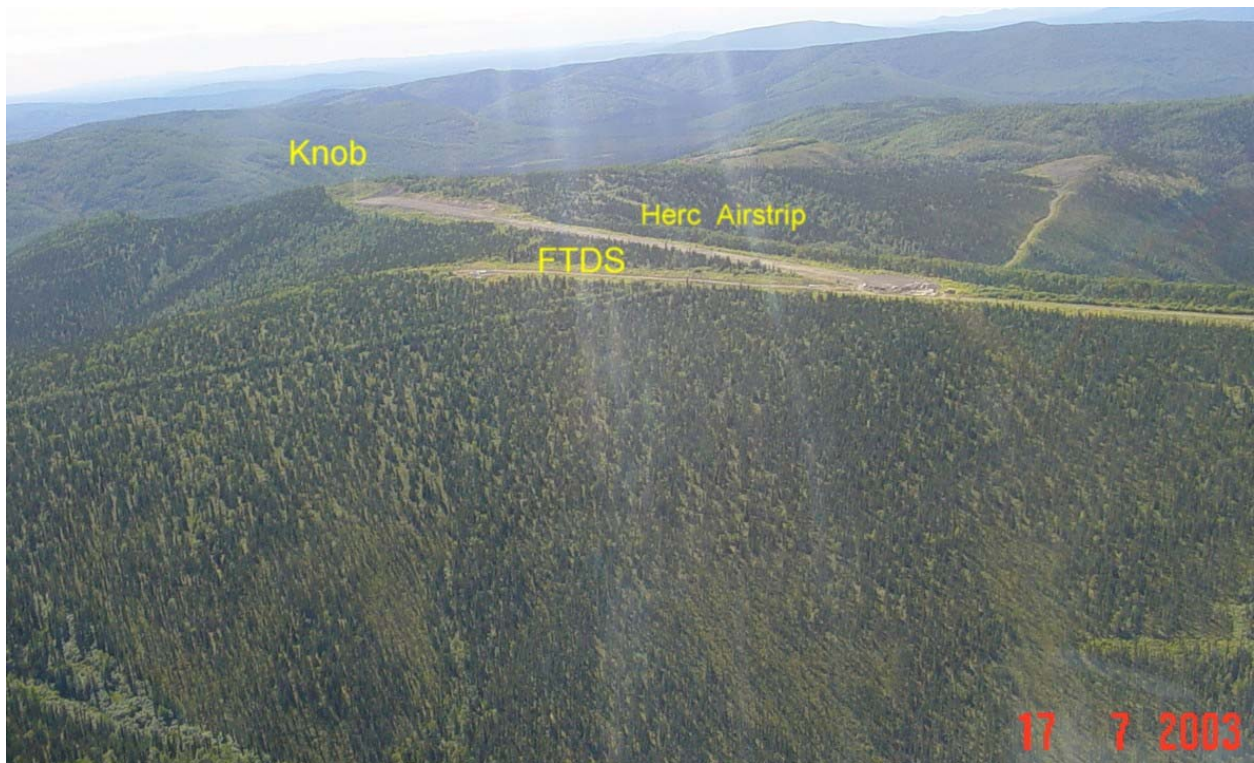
Knob On South End of Hercules Airstrip and Filtered Tailings Disposal Site
